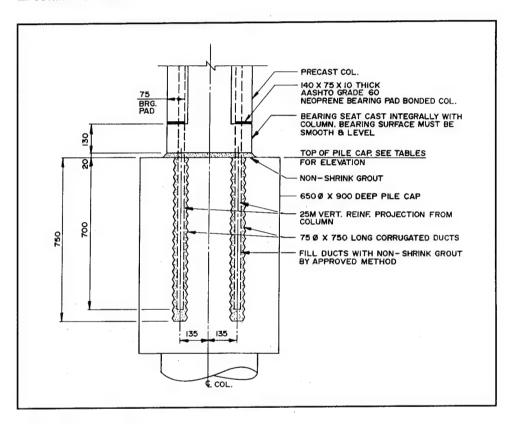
Drawing that shows how columns were anchored to pile caps, Winnipeg (from Ulyatt and Winch 1992)
